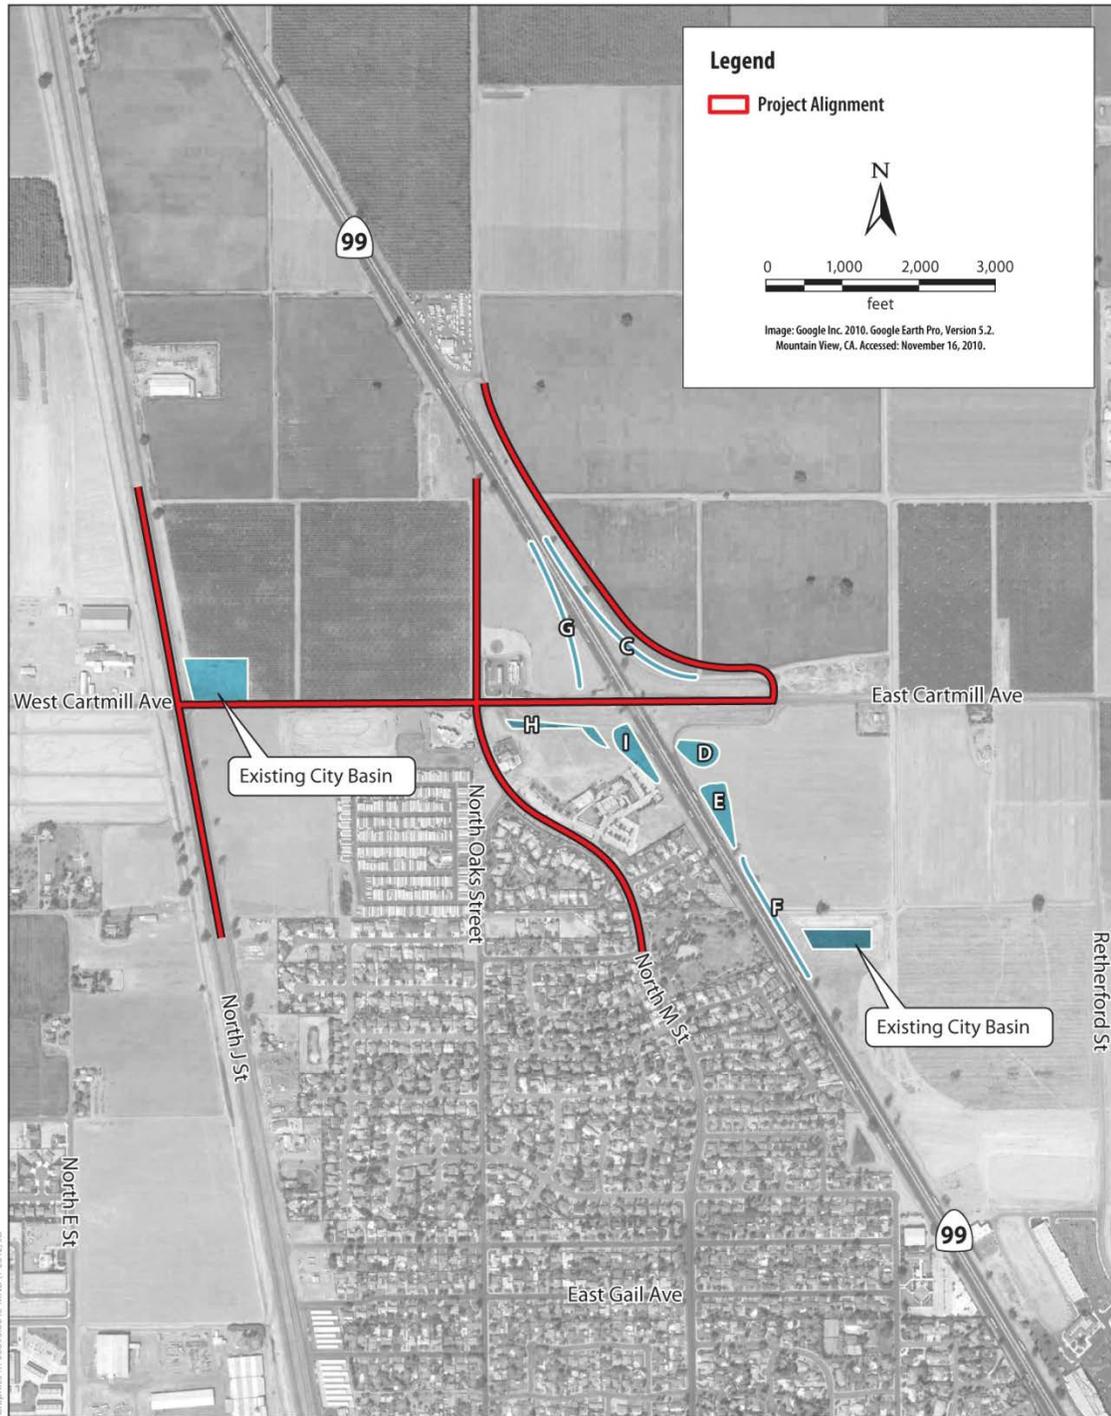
Existing and Planned Drainage Basins, Alternative 2
